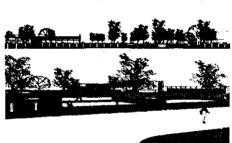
Perspective view- Proposed Plan of Town Hall maidan
